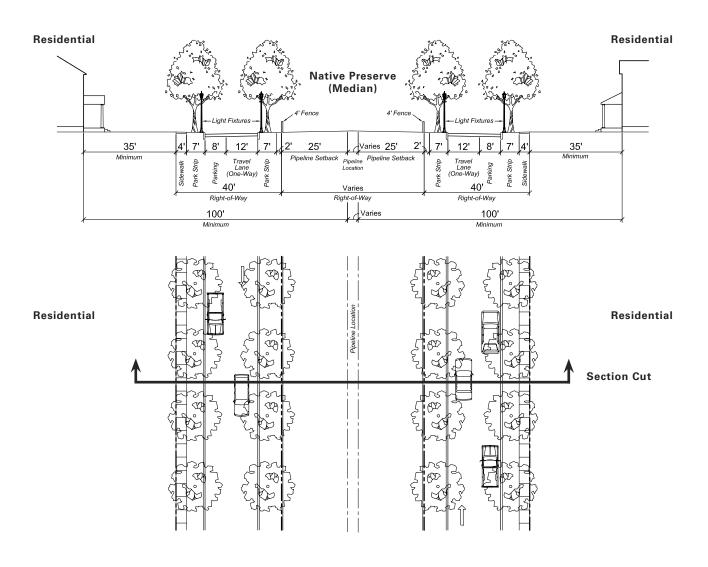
Proposed Section and Plan: Neighborhood Street E
